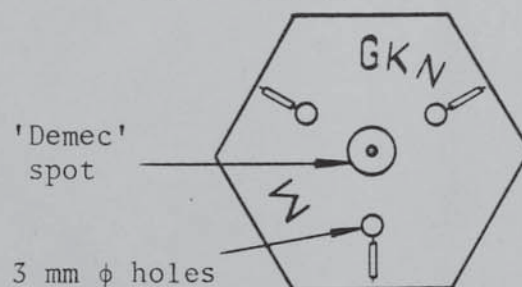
FULL SIZE TEST SPECIMEN
